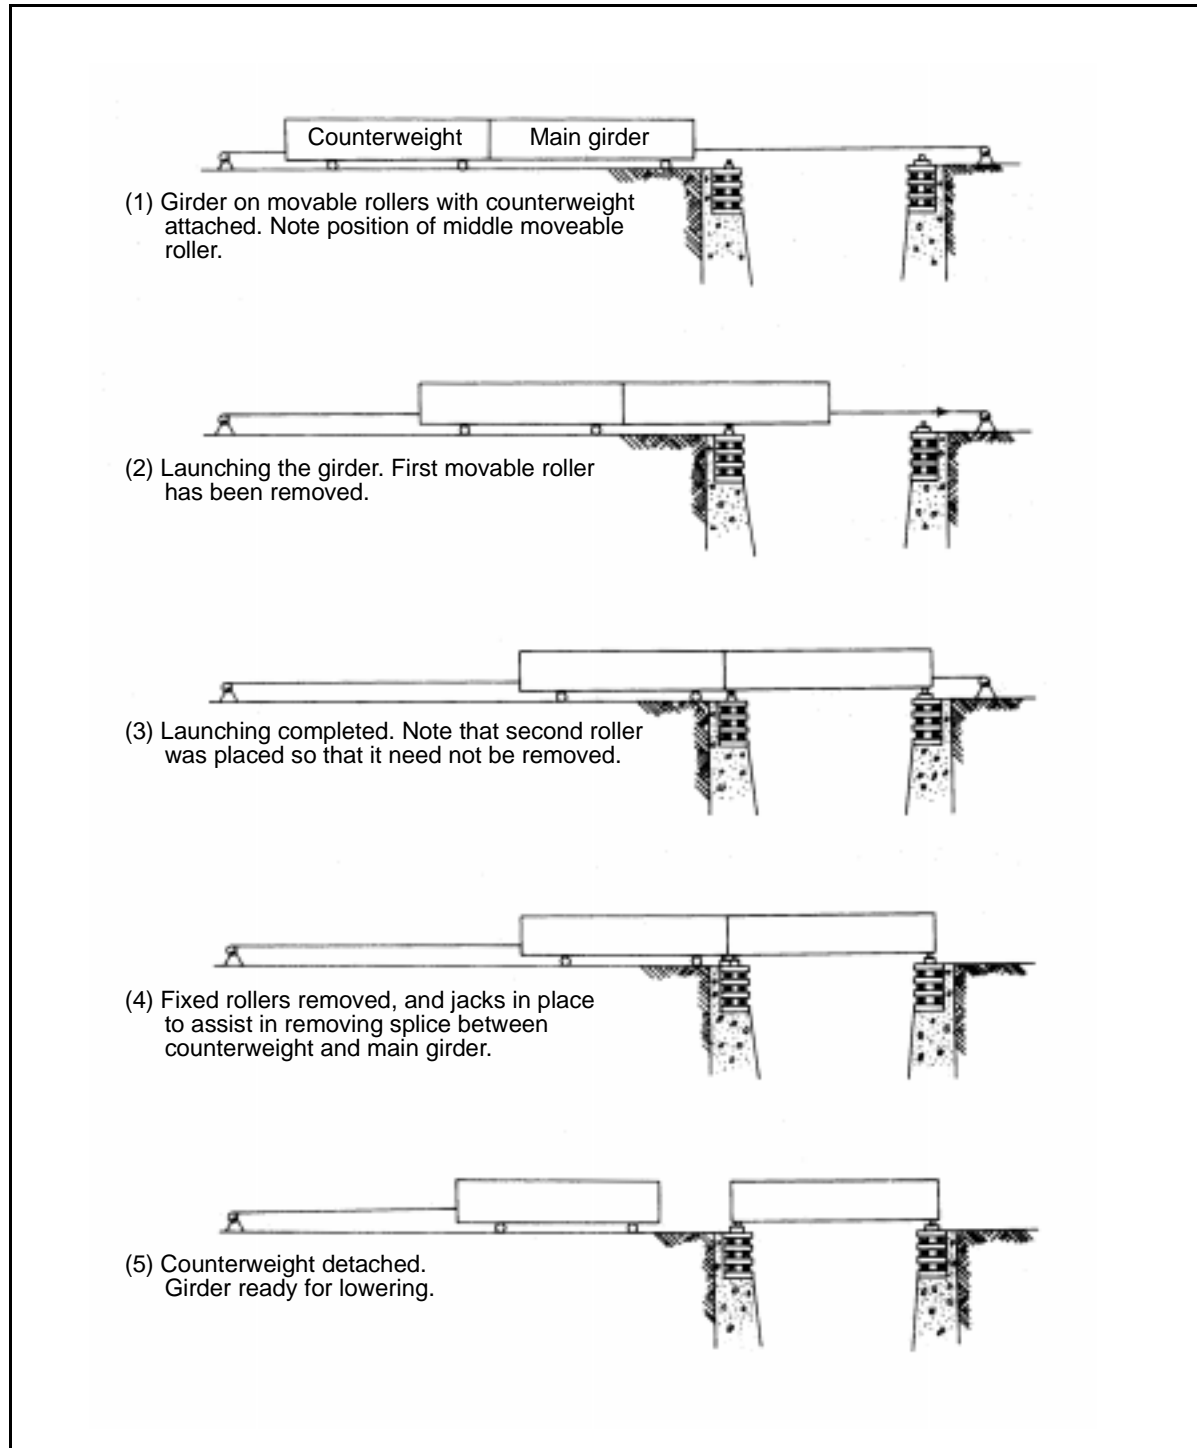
Launching Heavy Girders With an Equivalent-Weight Beam
